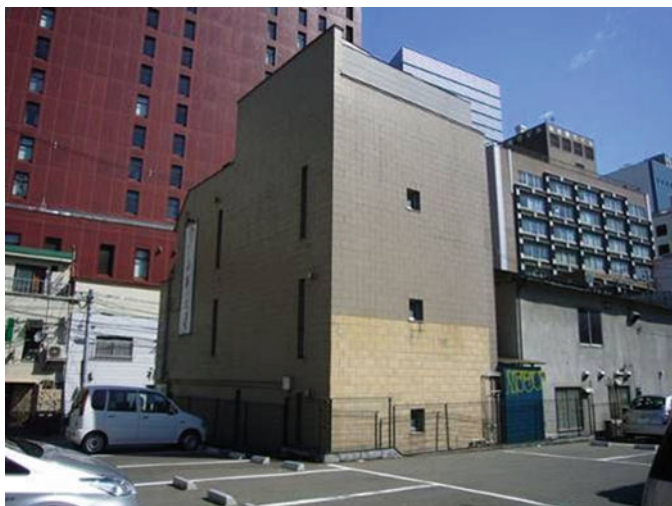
A reinforced fully grouted concrete masonry house without any damage
